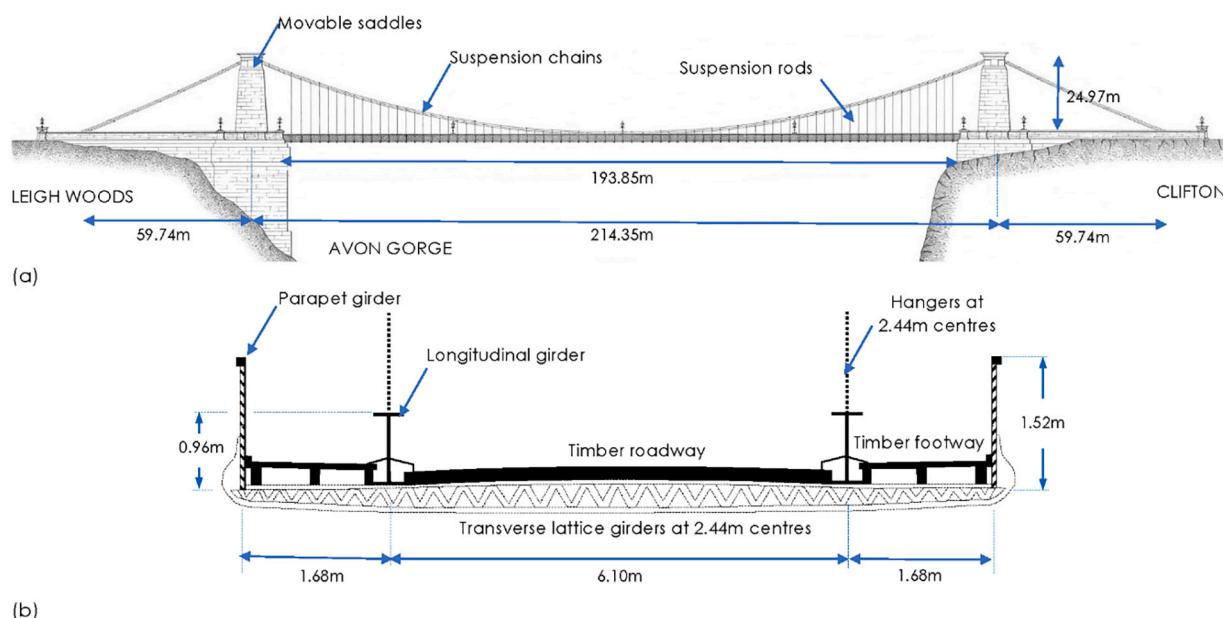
Deck details of the Clifton Suspension Bridge: (a) South elevation (adapted from [61] - copyright © ICE Publishing, used with permission under the STM Permissions Guidelines); (b) cross section (modified after [62]).
